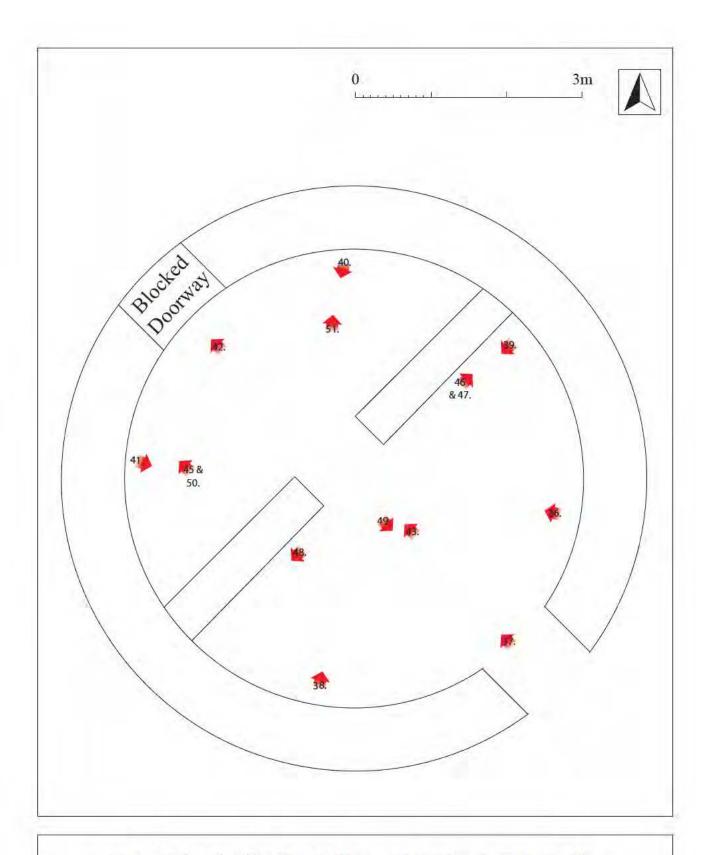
Location Plan Showing Photograph Positions for Plates 36 - 51 Plate 44 was Taken from the Centre of the Structure Looking Straight Upwards
